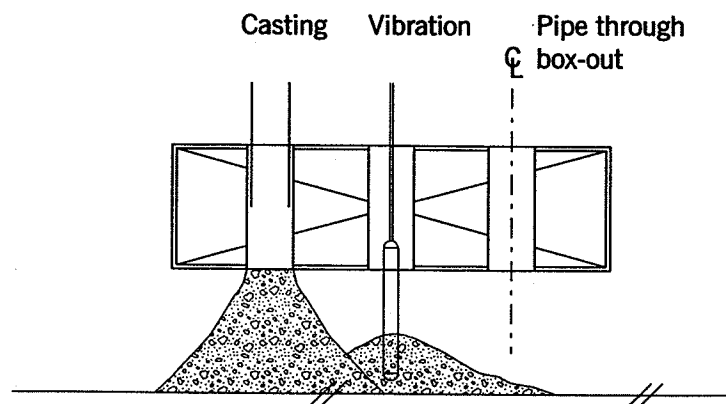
Casting and vibration of concrete under an opening with large horizontal dimension.
